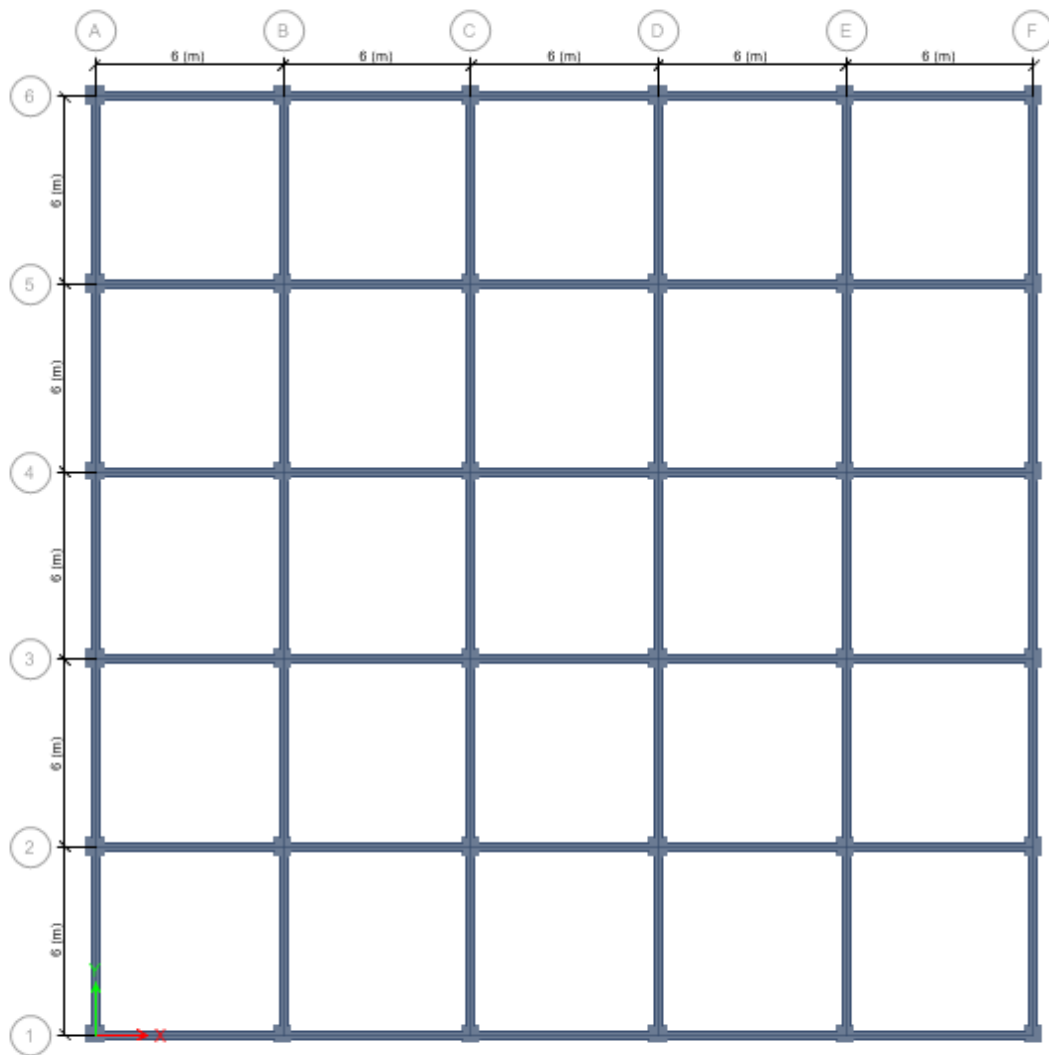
Typical floor plan/ typical floor plan for bare frame
